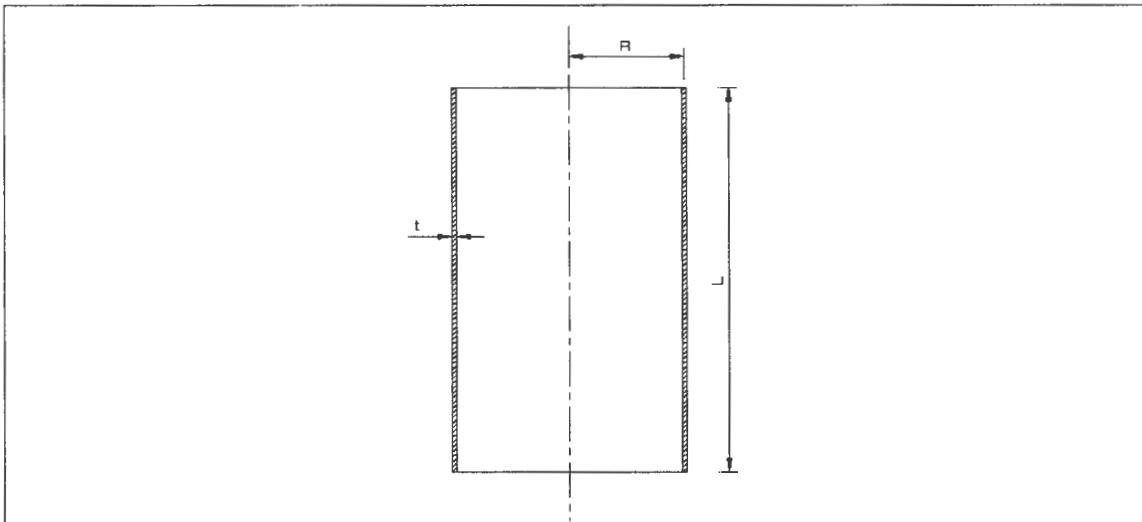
3 Un-stiffened cylindrical shell vertical section showing geometry and notation.
